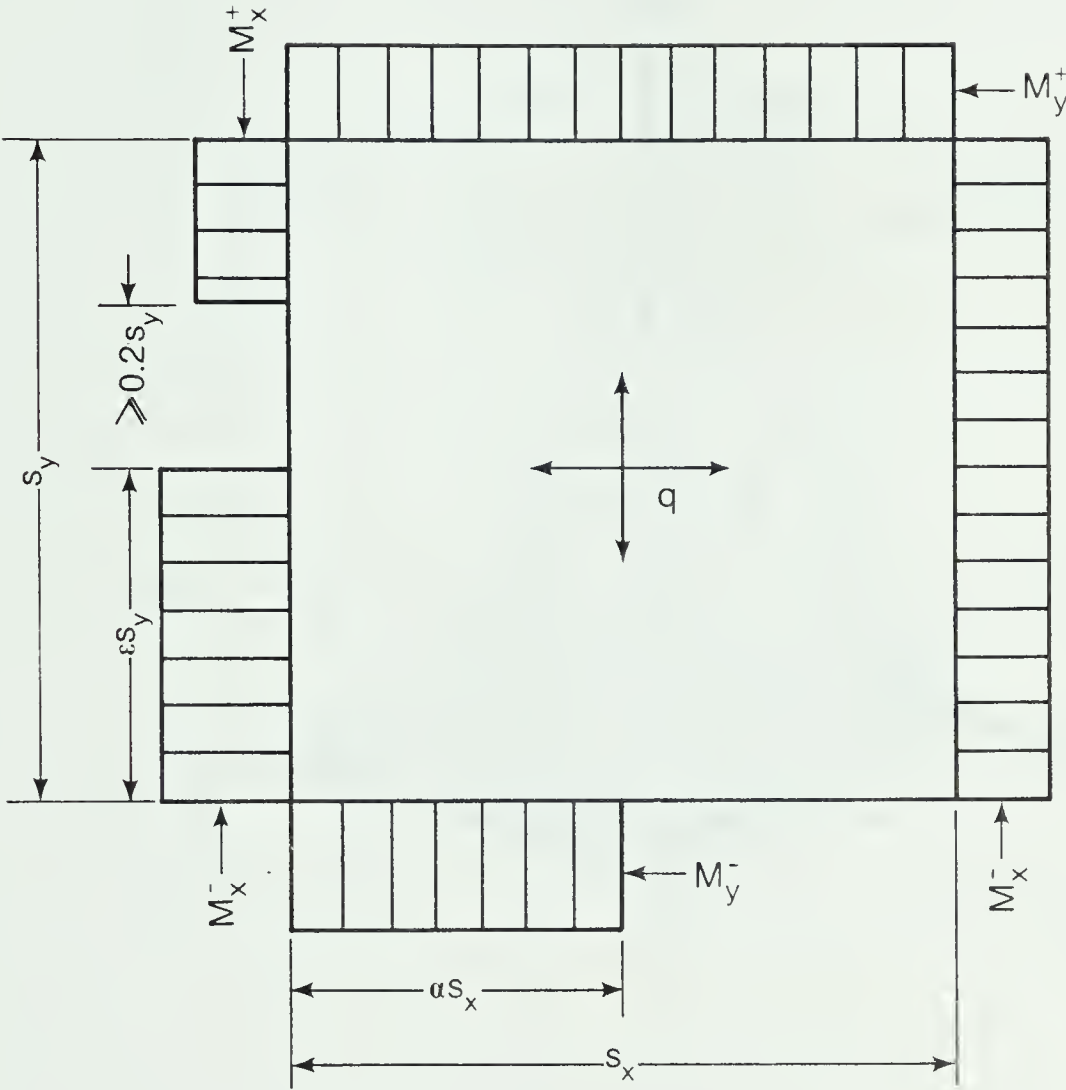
Plan View of Corner Supported Segment With Edge Moments of Opposite Sign
